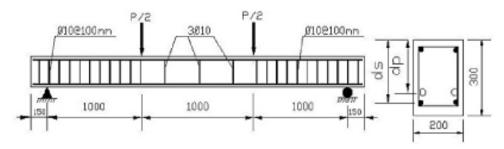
Detail of beams reinforcement tested by Oukaili and Khattab [10].
